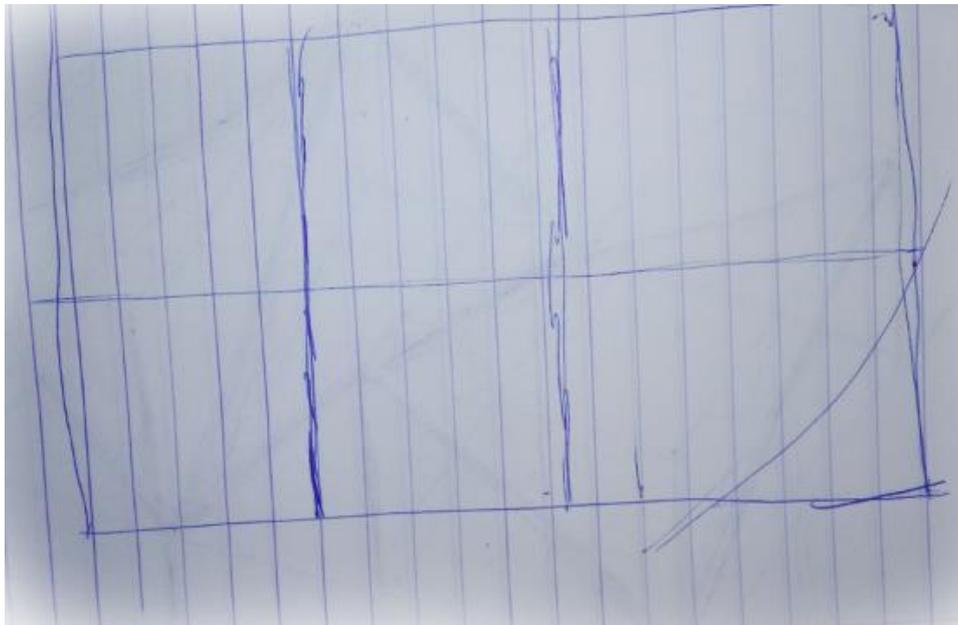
4: Initial hand sketch of the roof structure divided into three bays
